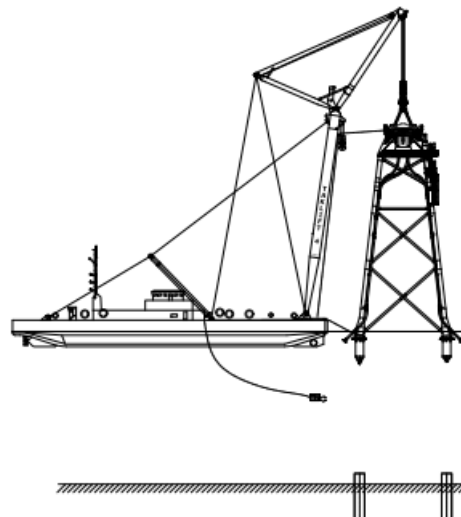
Jacket structure in the crane of the sheerleg ready for the installation on top of the pre-installed piles.
